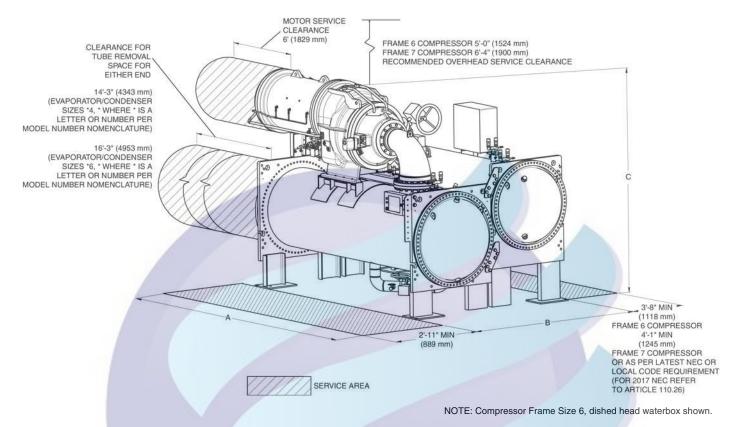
19XR Dimensions — Two-Stage Compressor Frame Sizes 6 and 7 (Refer to Table 2)
